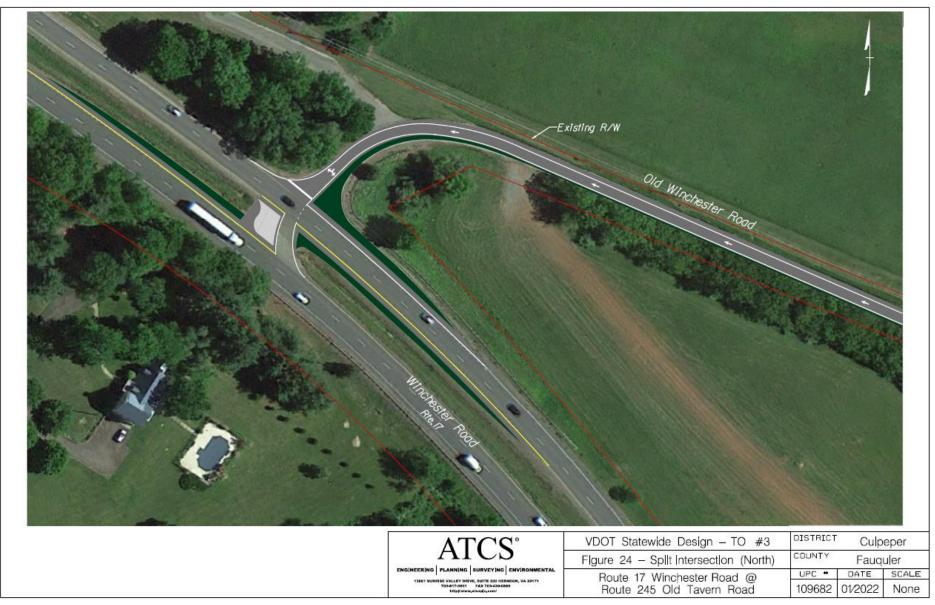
Split Intersection Alternative Concept Sketch – Northern Details
